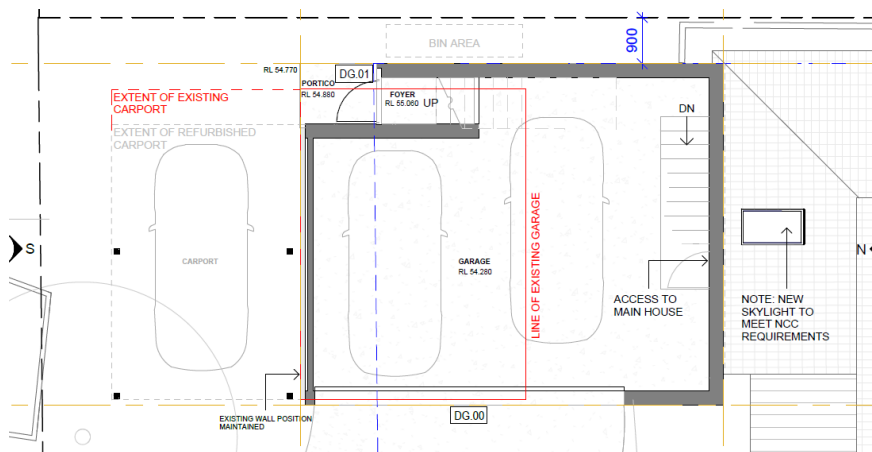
Proposed ground floor - garage - (source: Studio Lykke)
